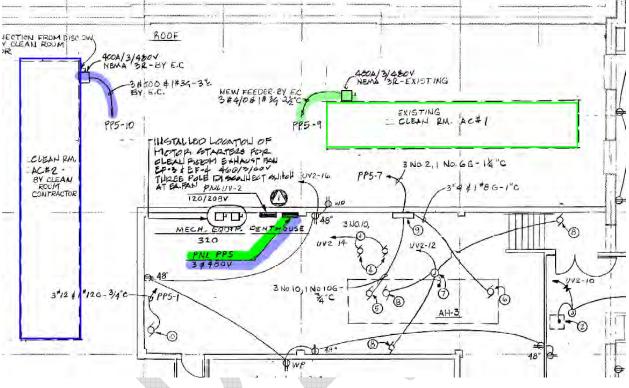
Rooftop HVAC Equipment Power Supply Plan
